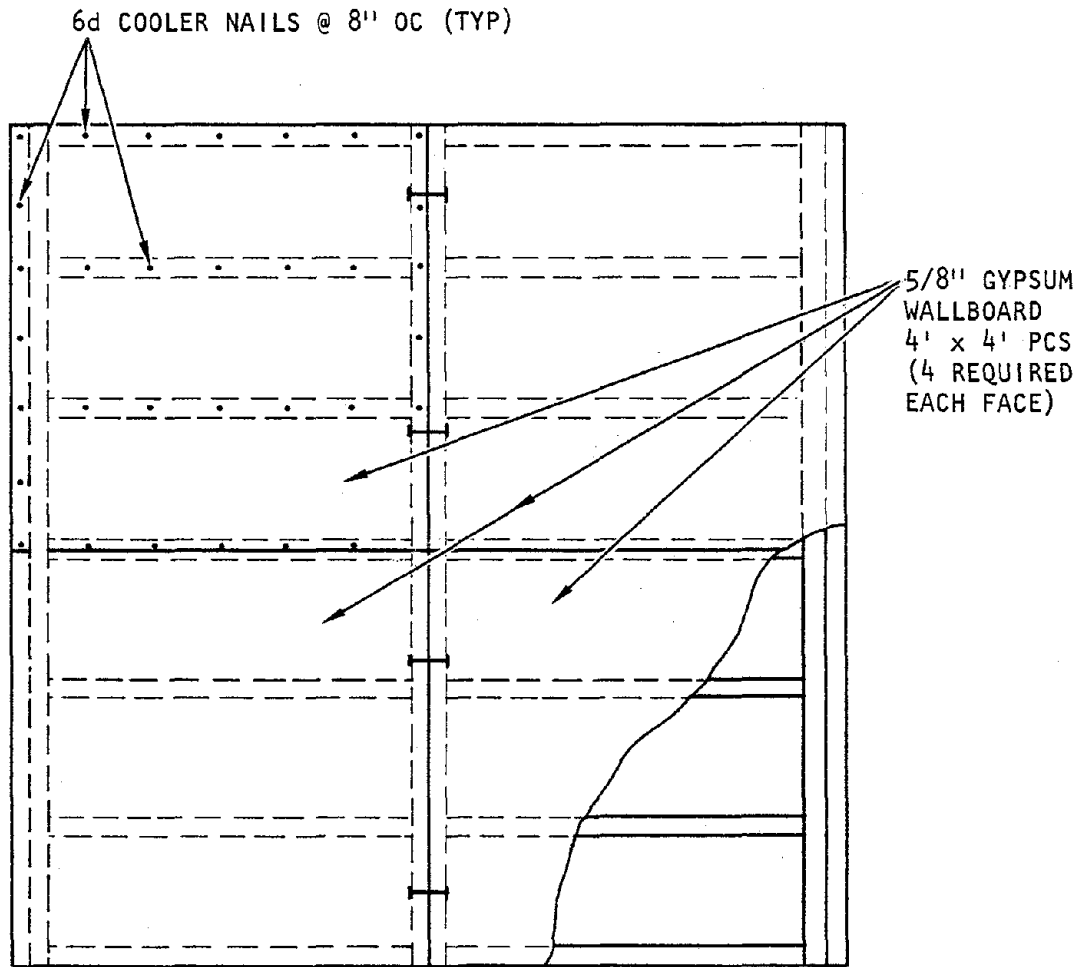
SPECIMEN B - GYPSUM HARD BOARD (VERTICAL JOINT)
